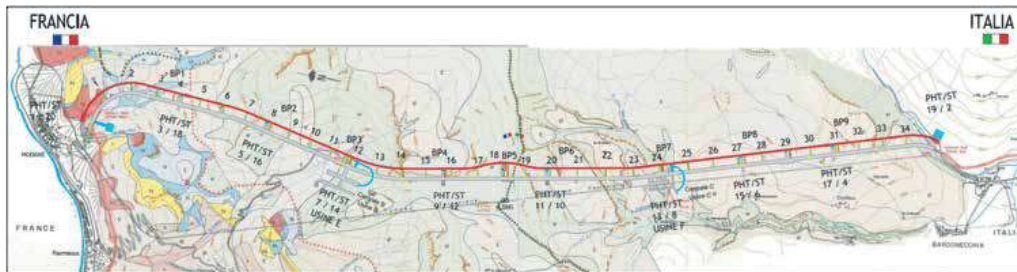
Schematic layout plan with route of the motorway tunnel and safety tunnel (in red)
